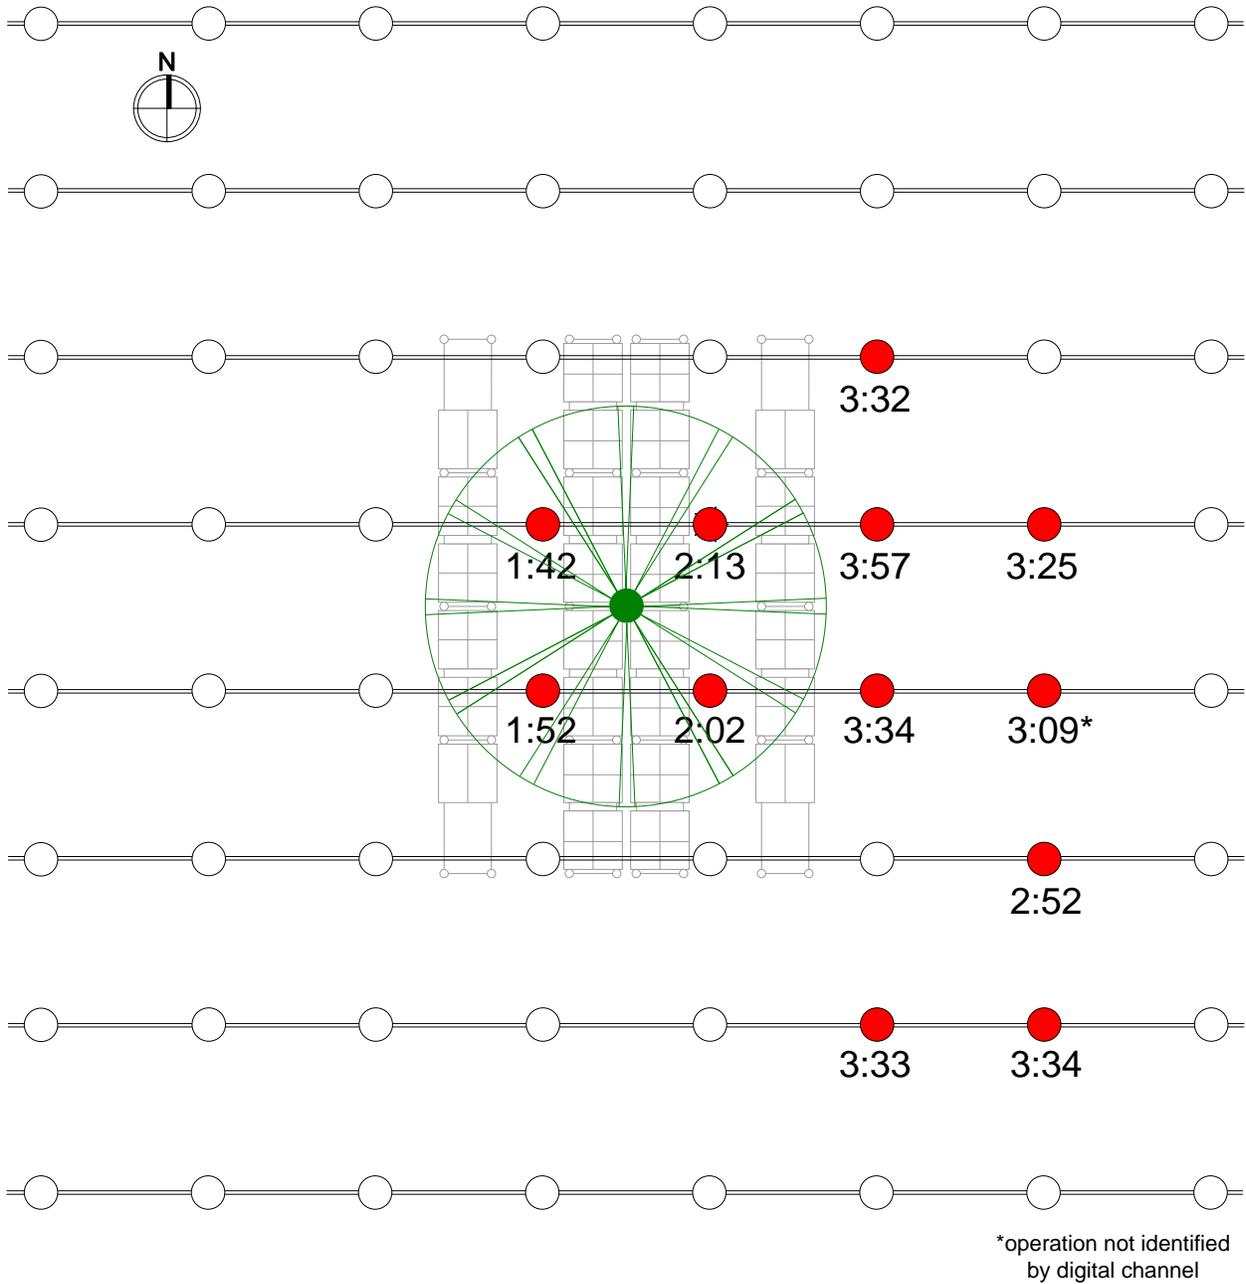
Plan view of sprinkler operation pattern - Test 2
